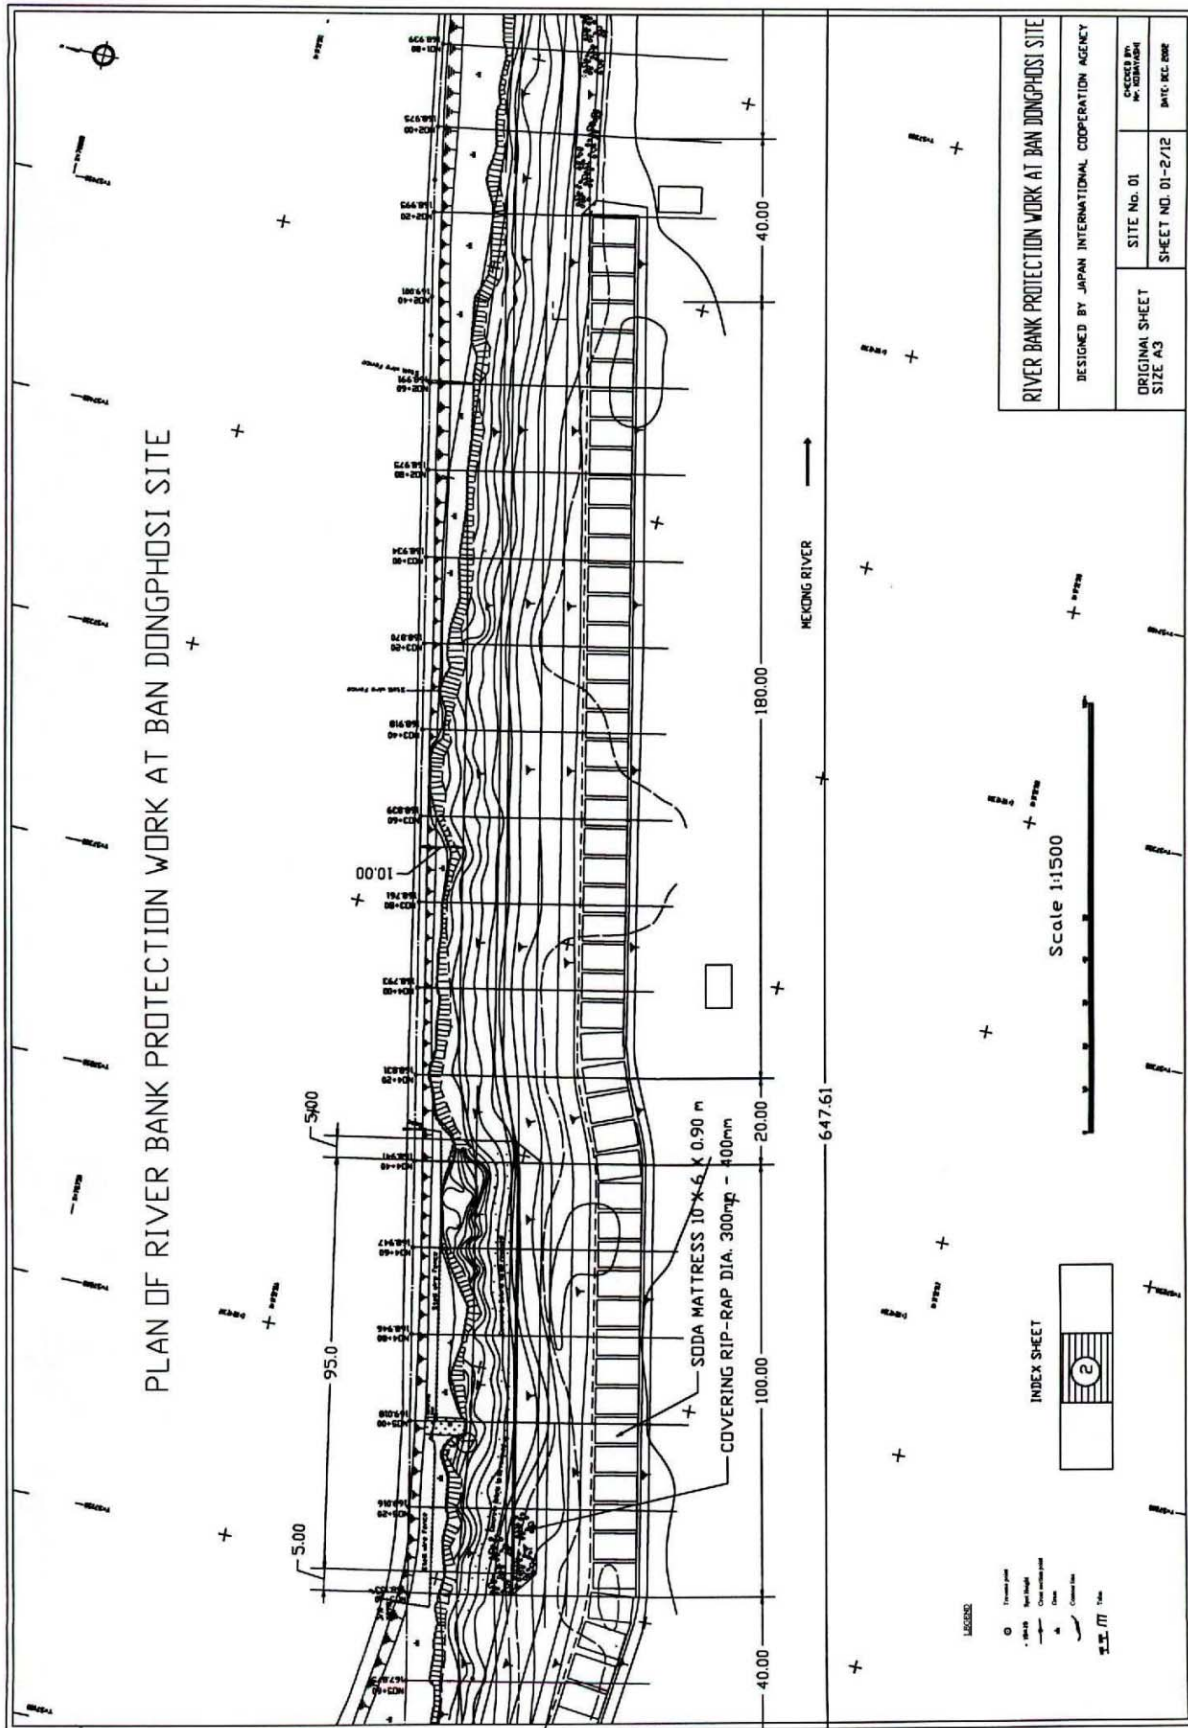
(2/3) Plan of River Bank Protection Work at Ban Dongphosi Site
